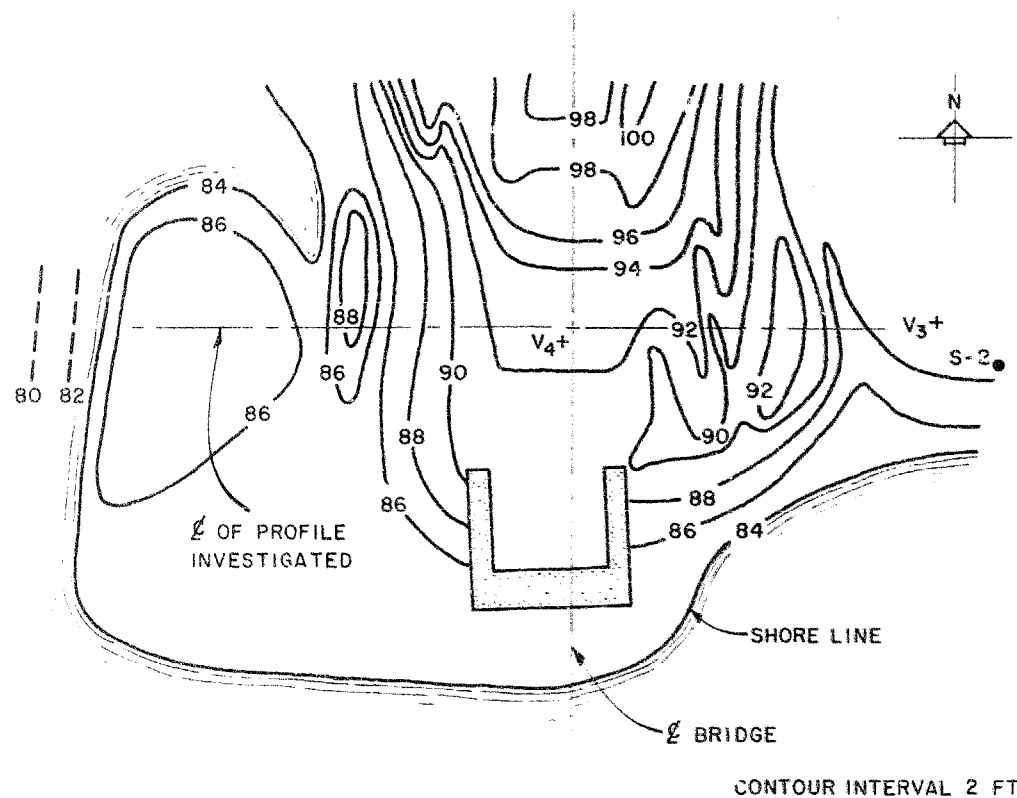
PLAN VIEW OF NORTH ABUTMENT
